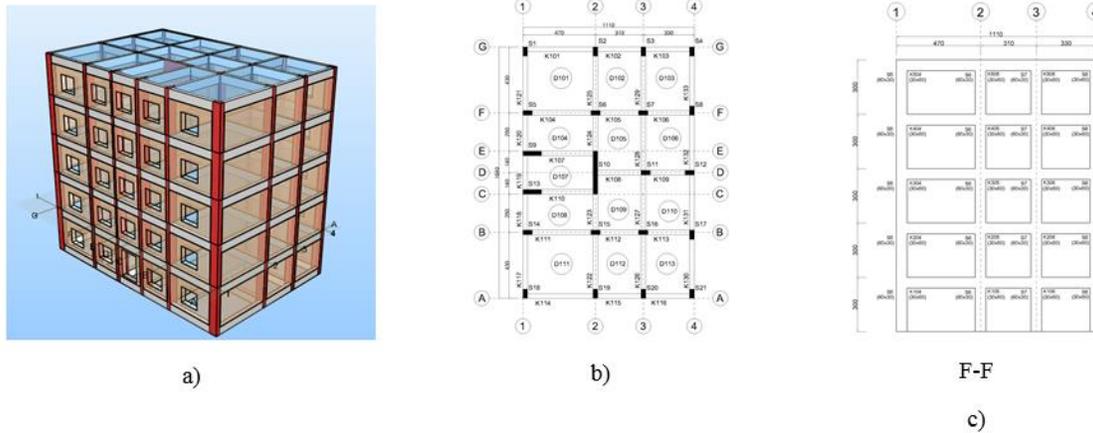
5-story, a) 3D view, b) plan, c) FF axes frame
